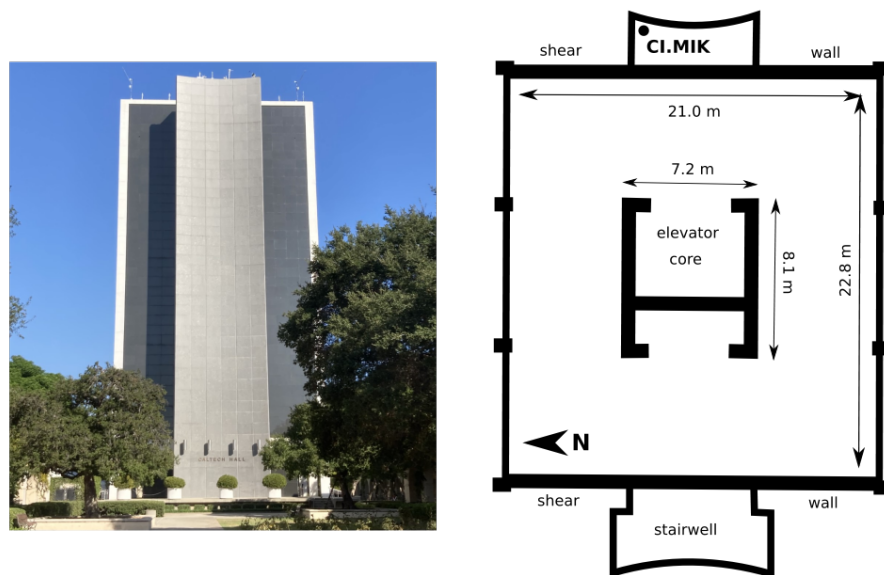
S1: (left) East-facing photograph of Caltech Hall showing the west shear wall and stairwell. (right) Plan-view schematic of Caltech Hall showing the major structural elements of the building and the location of CI.MIK on the ninth floor.
